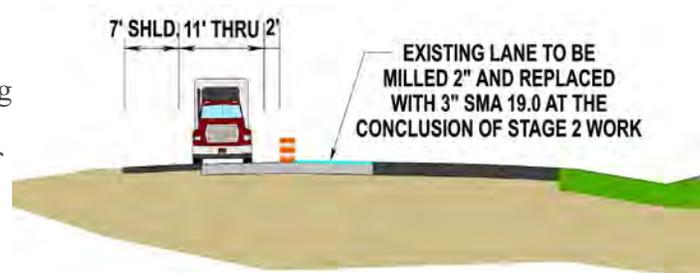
Pavement Build-up of Existing Travel Lanes
